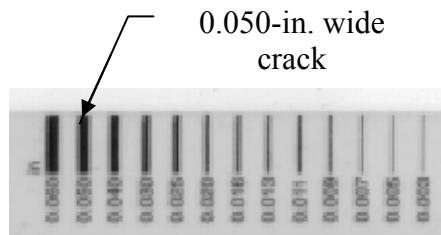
Crack width of 0.050 inches from tolerable crack width card
